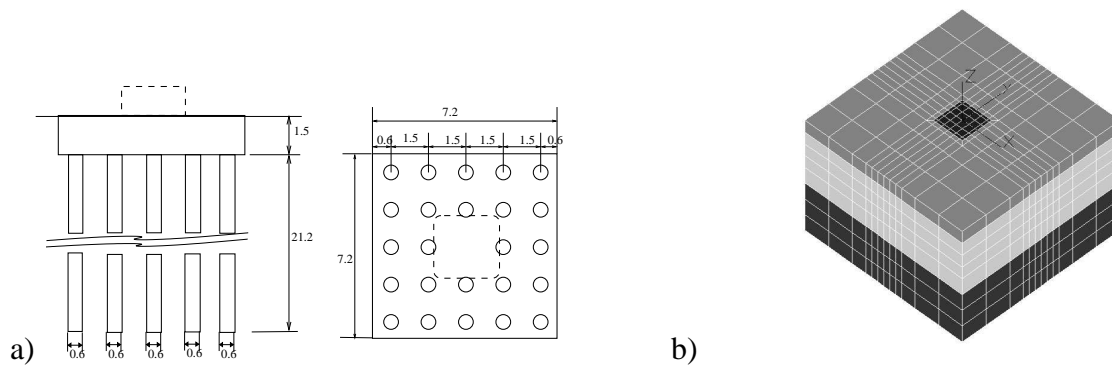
(a) Schematics of the pile cap and the piles. (b) Finite element mesh for soil foundation system.
